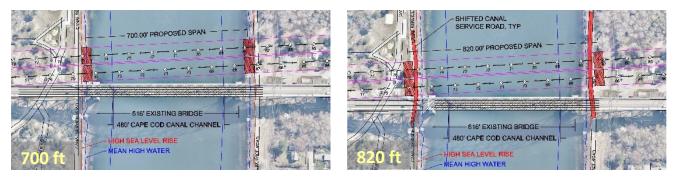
Footing Layout for 700' and 820' Spans
